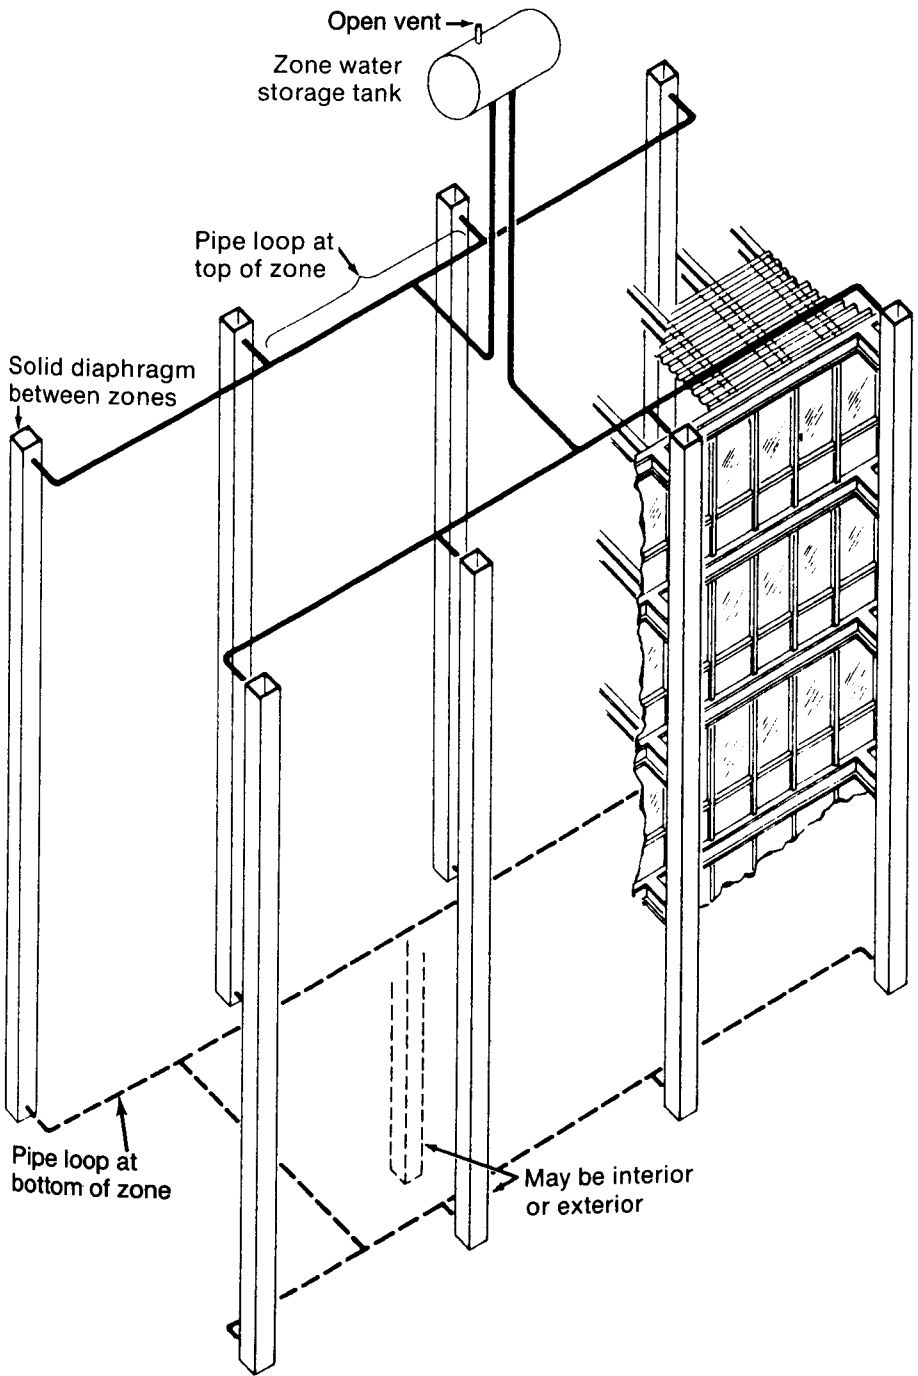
Schematic arrangement of fire-protection system for liquid-filled columns.
